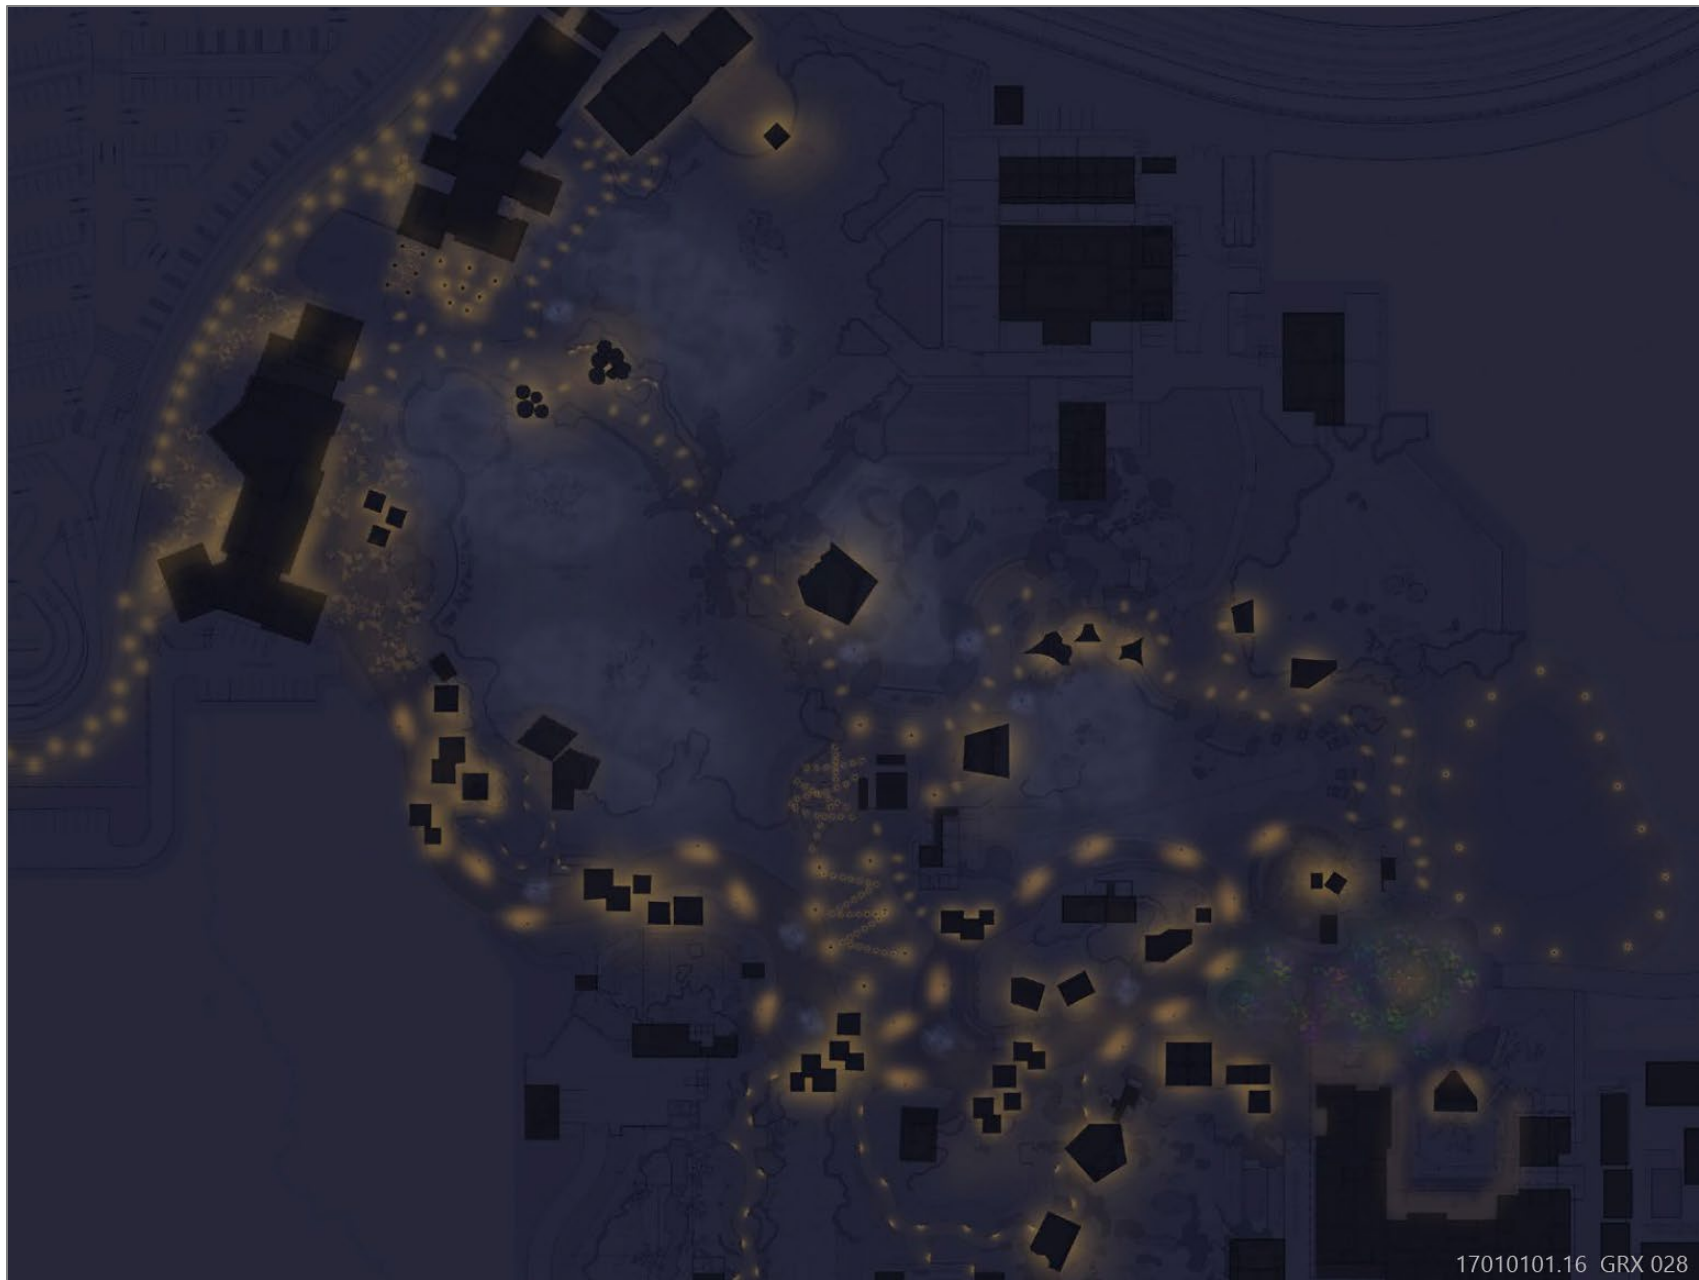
Exterior Site FOH Lighting Glow Plan
